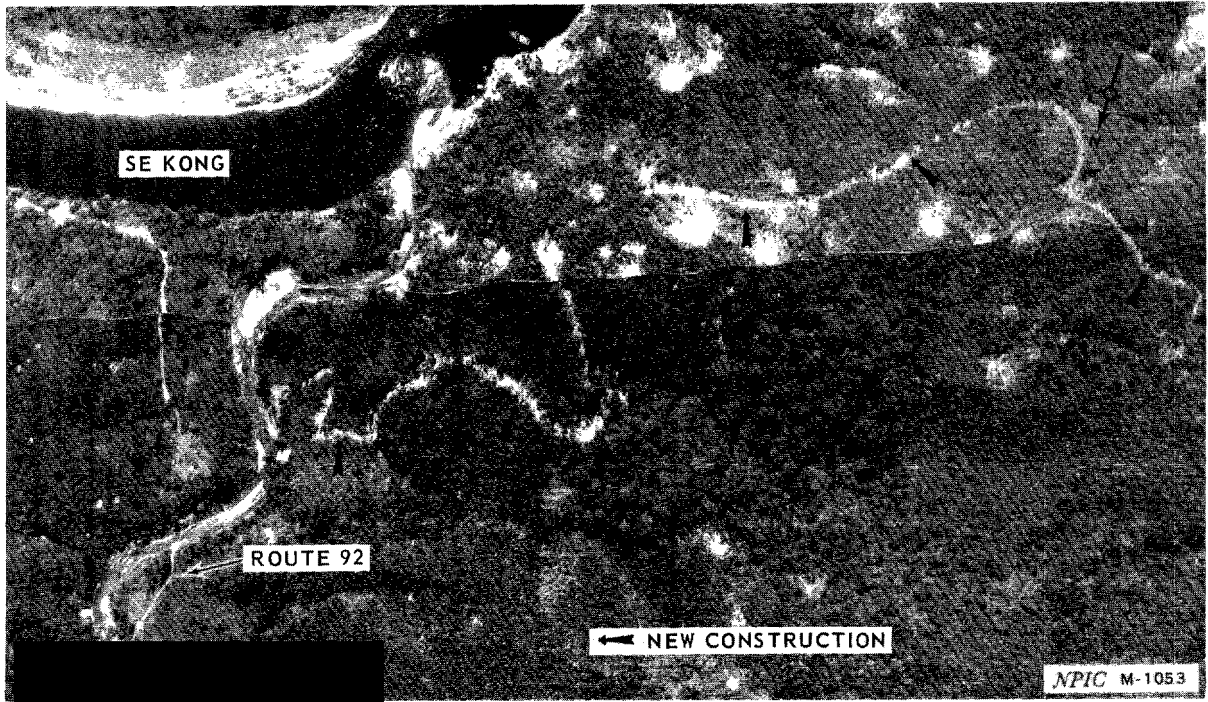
ROAD CONSTRUCTION, BAN BAC, LAOS
